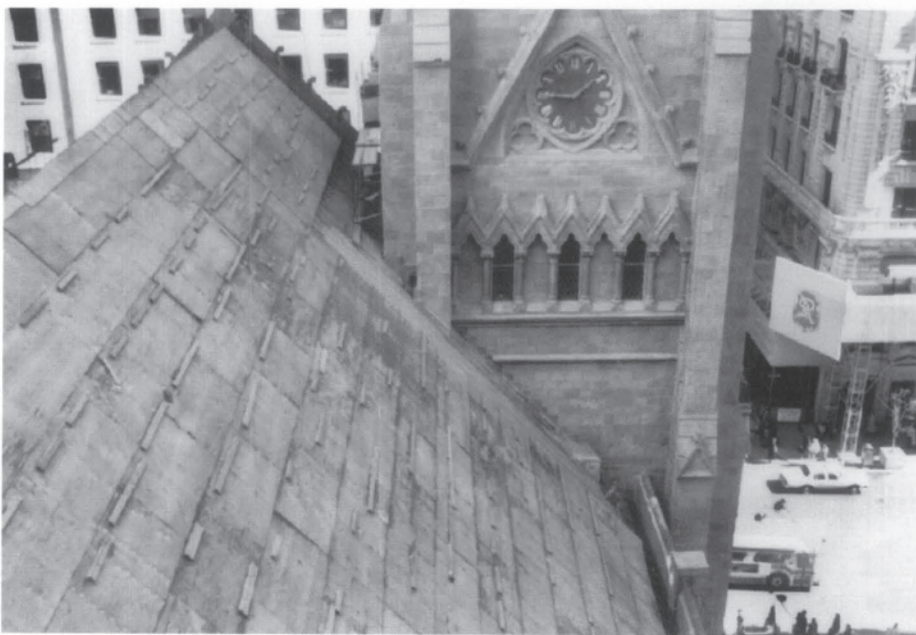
Dropped equipment, tools, and materials all present risks when new construction rises above neighboring historic structures. In this case, the historic slate roof was completely covered with sheets of exterior grade plywood. Photo: National Park Service files.
